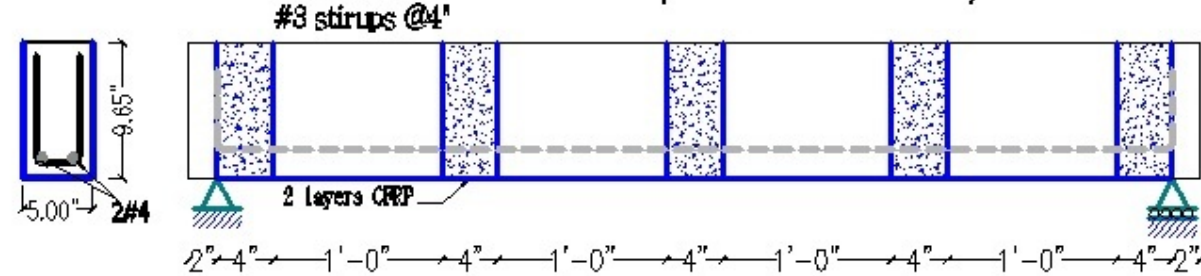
c Set #2 Beam Details.[1 ft=304.8mm, 1 in=25.4mm]
